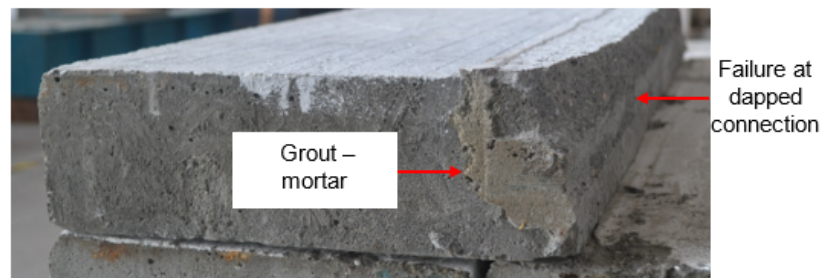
Failure of the wall connection at the joint interface of grout mortar and the dapped end for wall-to-wall connection Type 1
